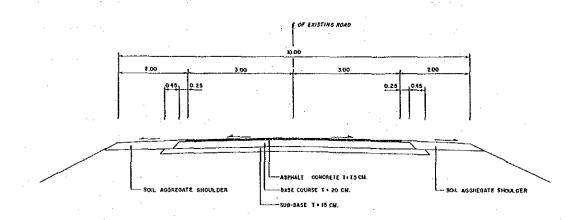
FIGURE TYPICAL PAVEMENT STRUCTURE FOR FLEXIBLE PAVEMENT IM ~ 22
